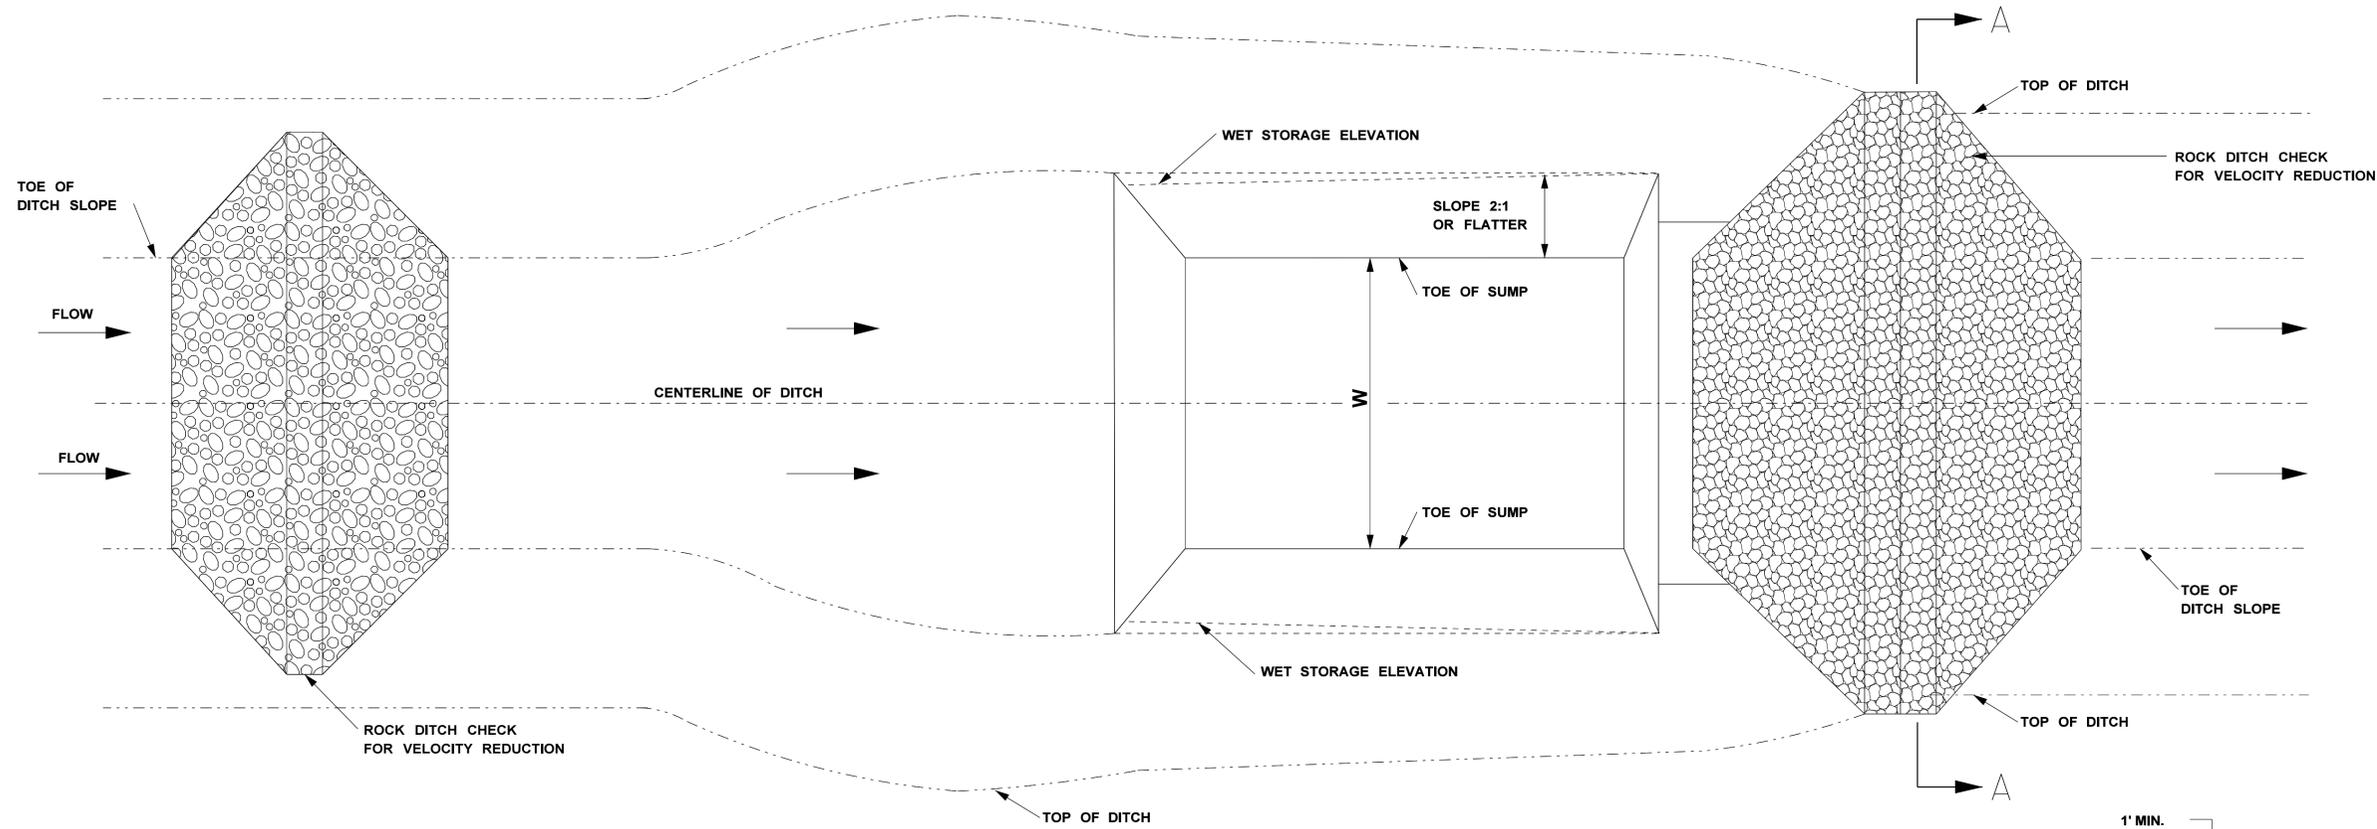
DETAIL FOR SPACING BETWEEN DITCH CHECKS
